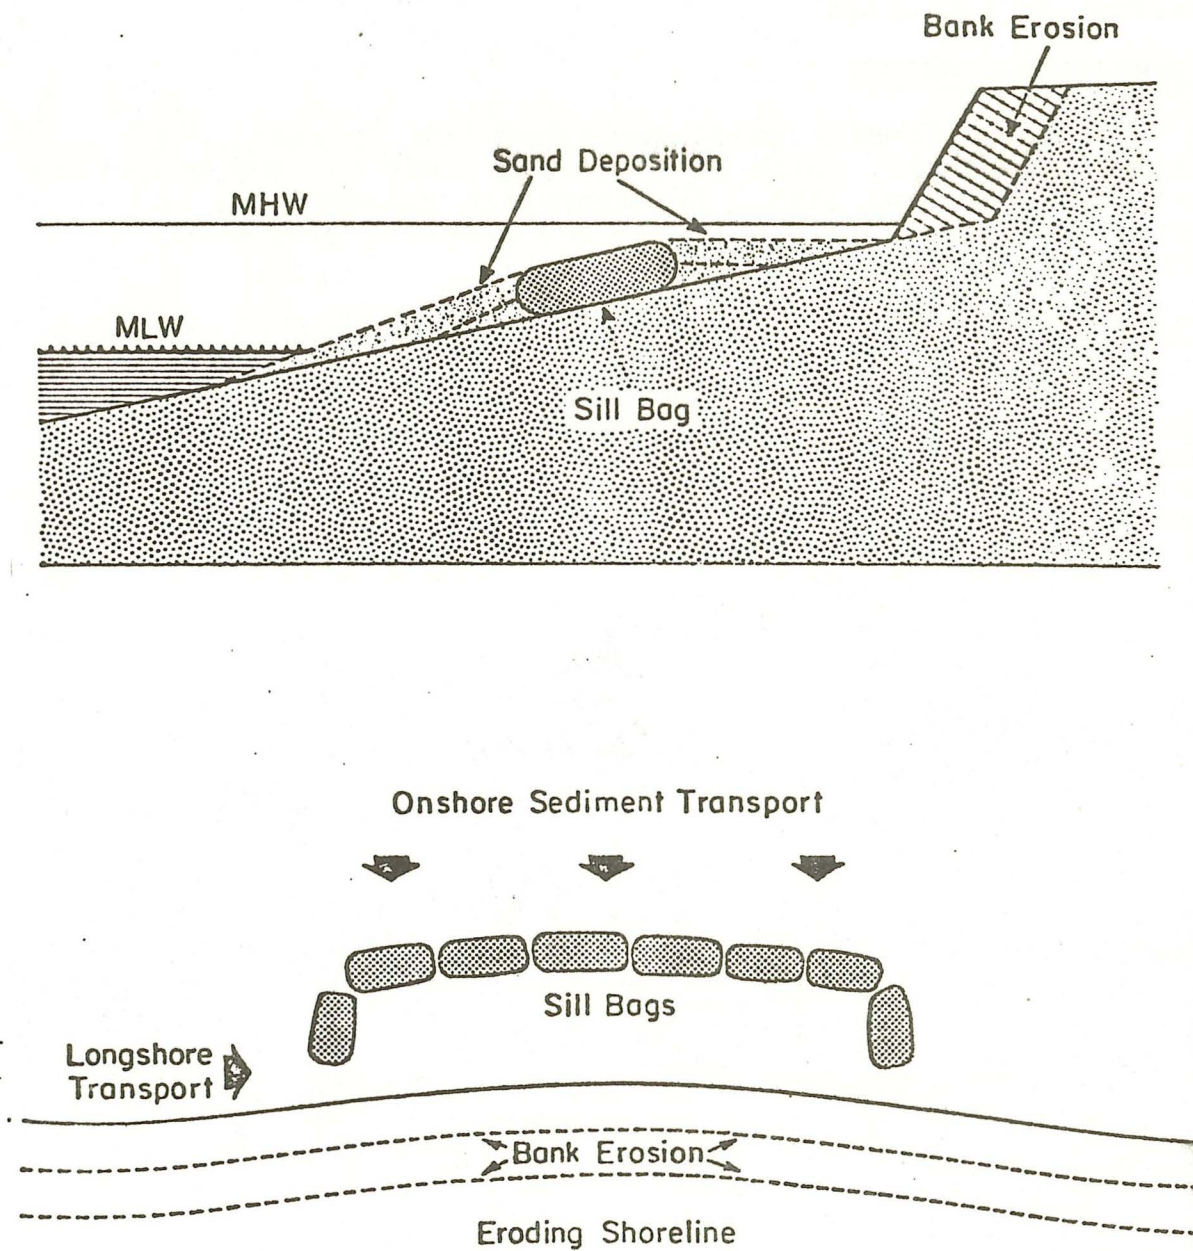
Schematic Section (top) and plan (bottom) view of a sill bag perched beach.
